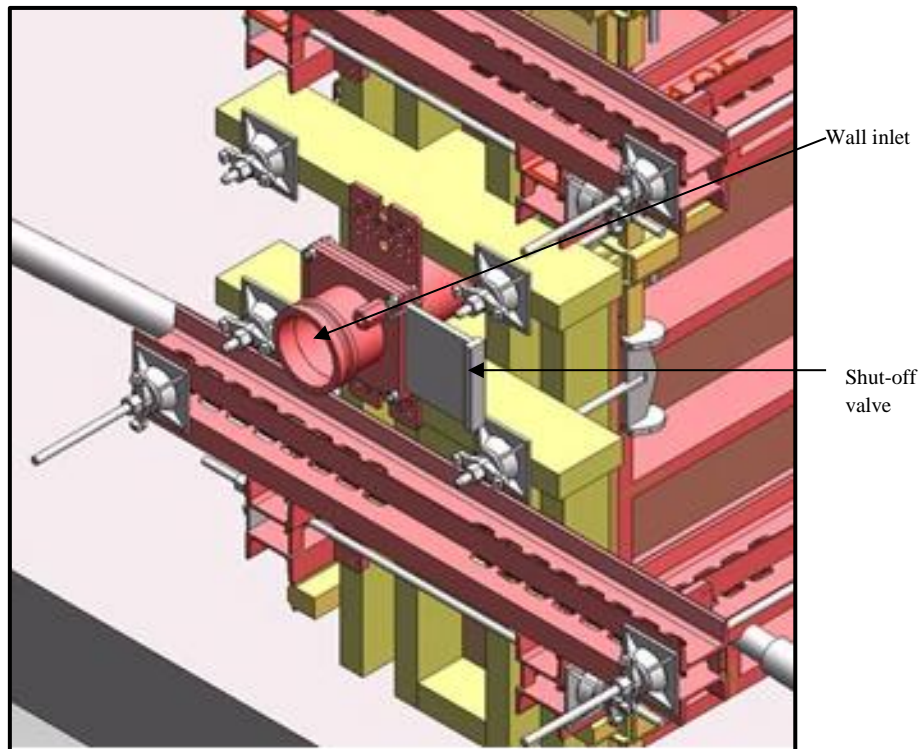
A 3D Autocad design drawing of the wall inlet and shut-off value.
